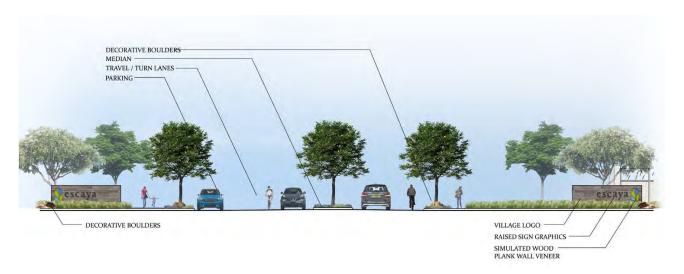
Secondary Village Entry Concept Plan (Paseo Cultura @ Heritage Road)
